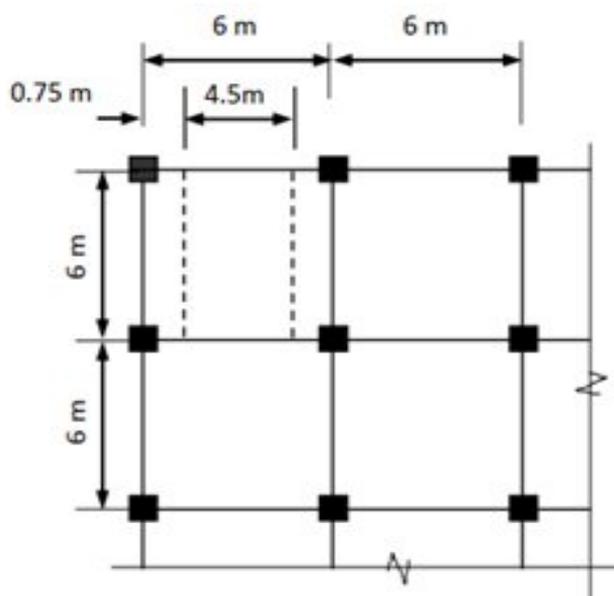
Part of floor plan (Bhatt et al (2006): 8.6.6 Example)
